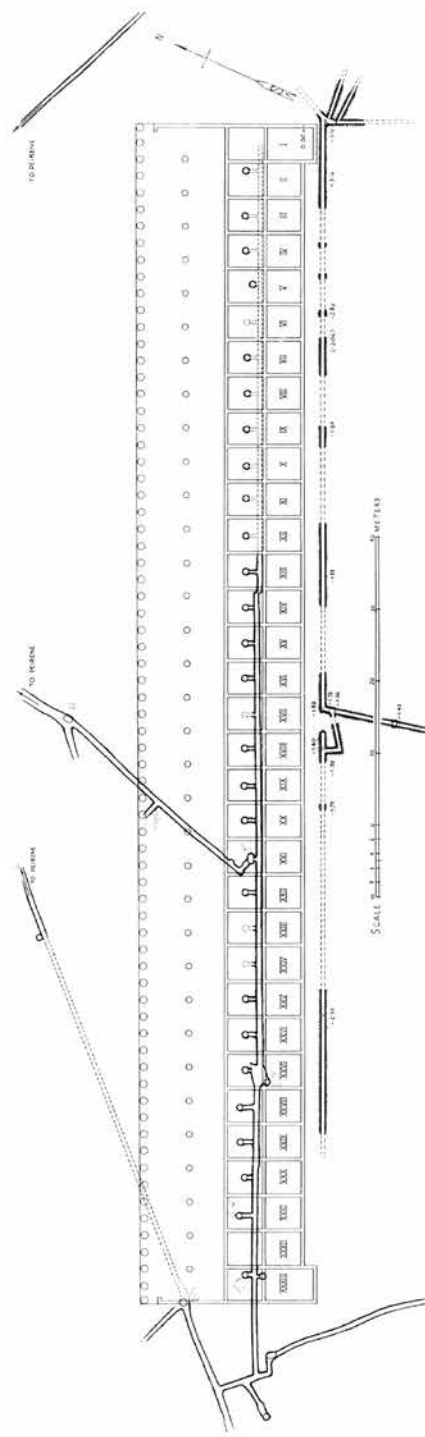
The tunnel under the South Stoa. Corinth 1.4, plan IX.
